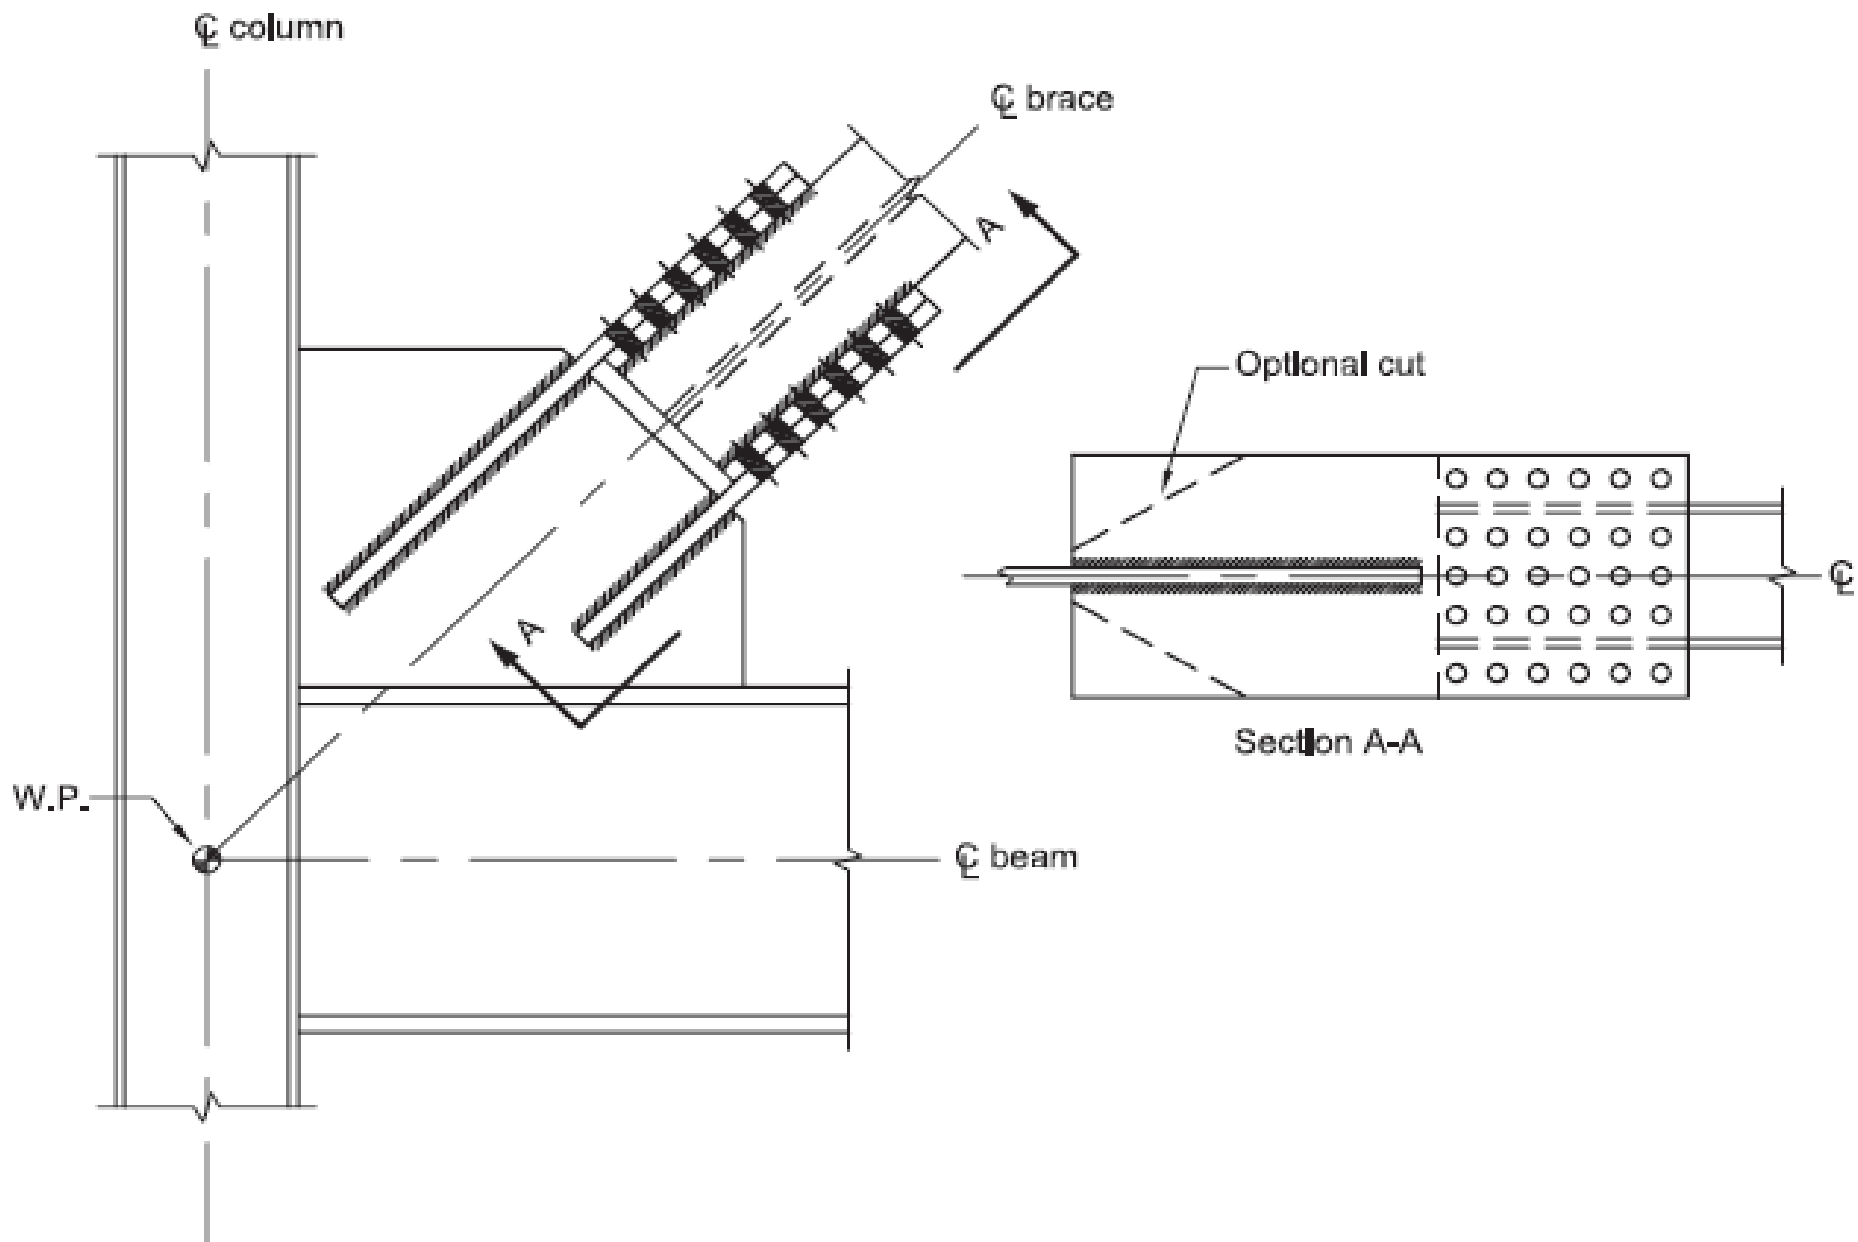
Wide-flange brace (flange to view) with four angles connecting to gusset.
